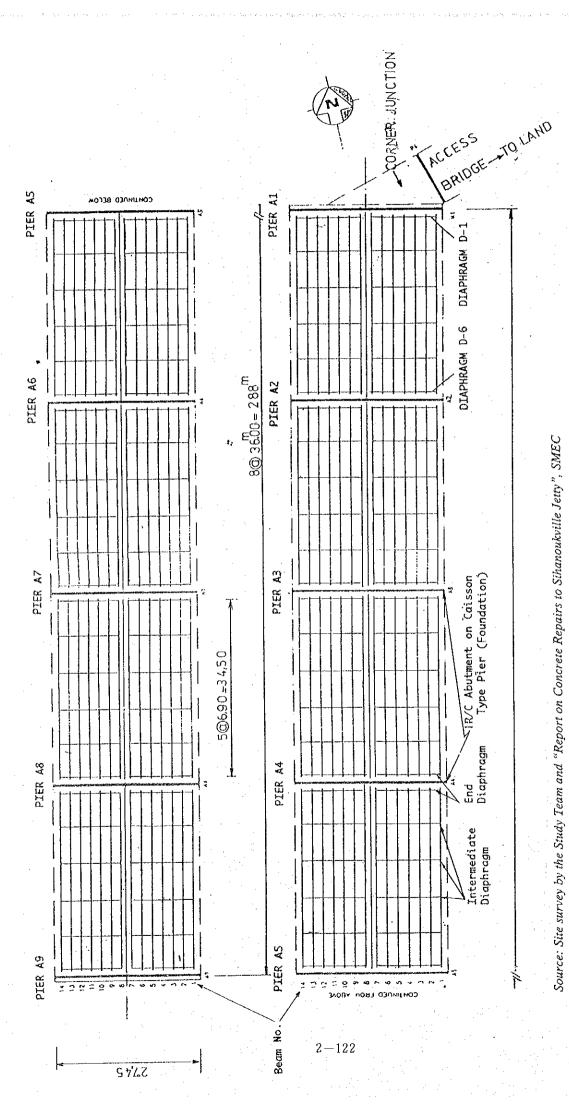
(1)-2 Structural layout plan of Main Jetty (Old Port)
